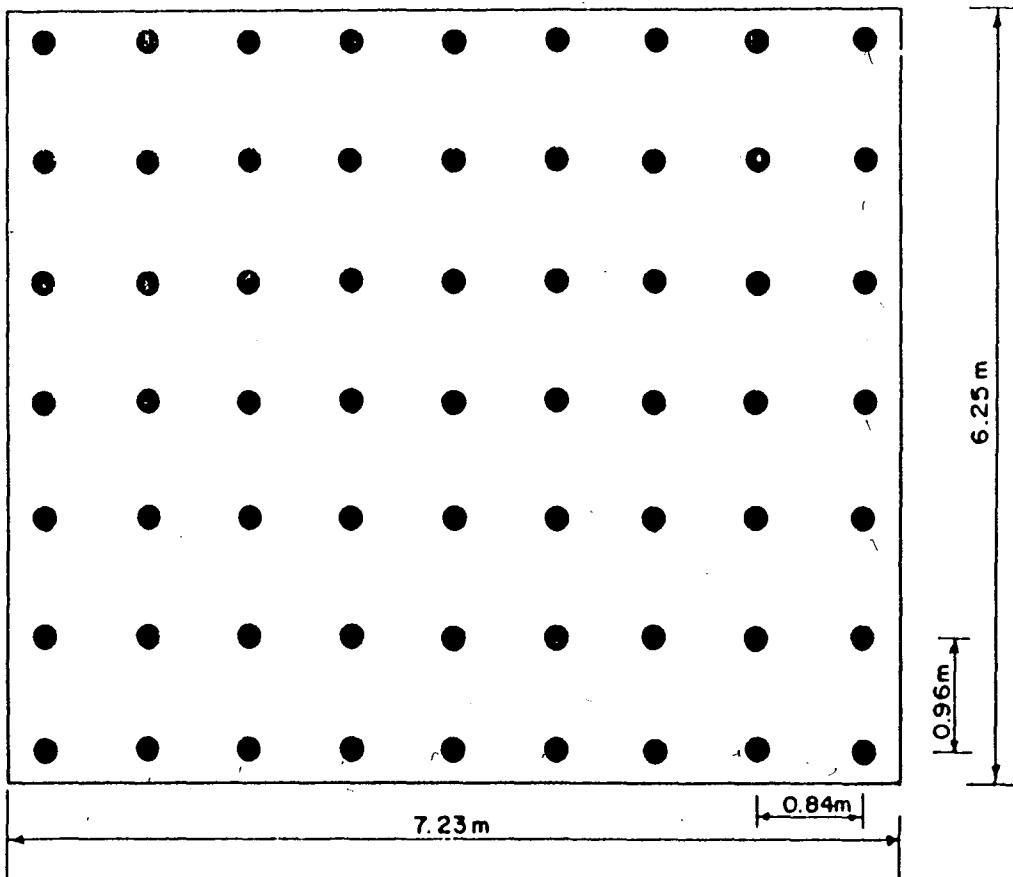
Pile arrangements in ex. 3 Scale 1:64
